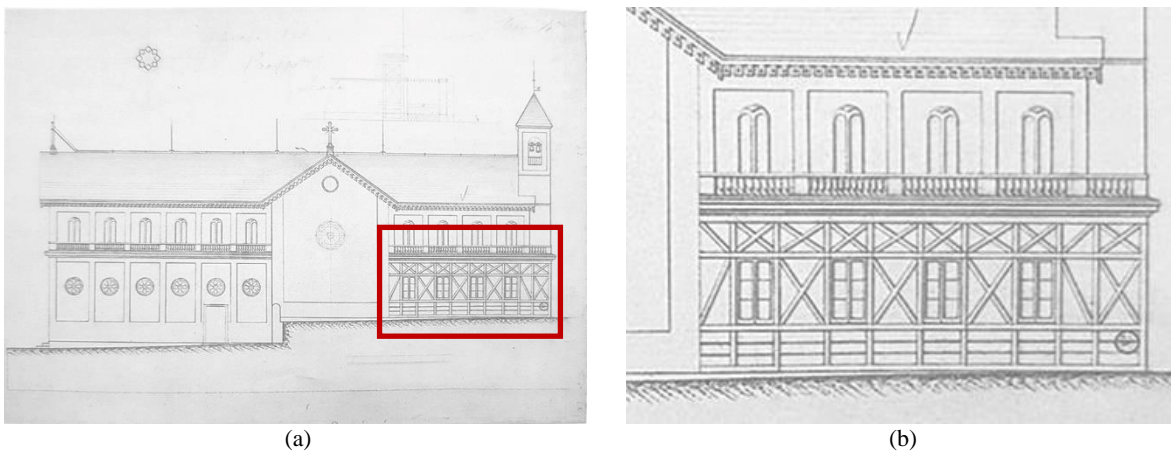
Historic drawing of the North façade (a) and relative detail of the timber frame layout (b). Source: (“Archivio di Stato di Napoli, Corpo Reale Genio Civile, fascio 342, incart. 3” n.d.)
